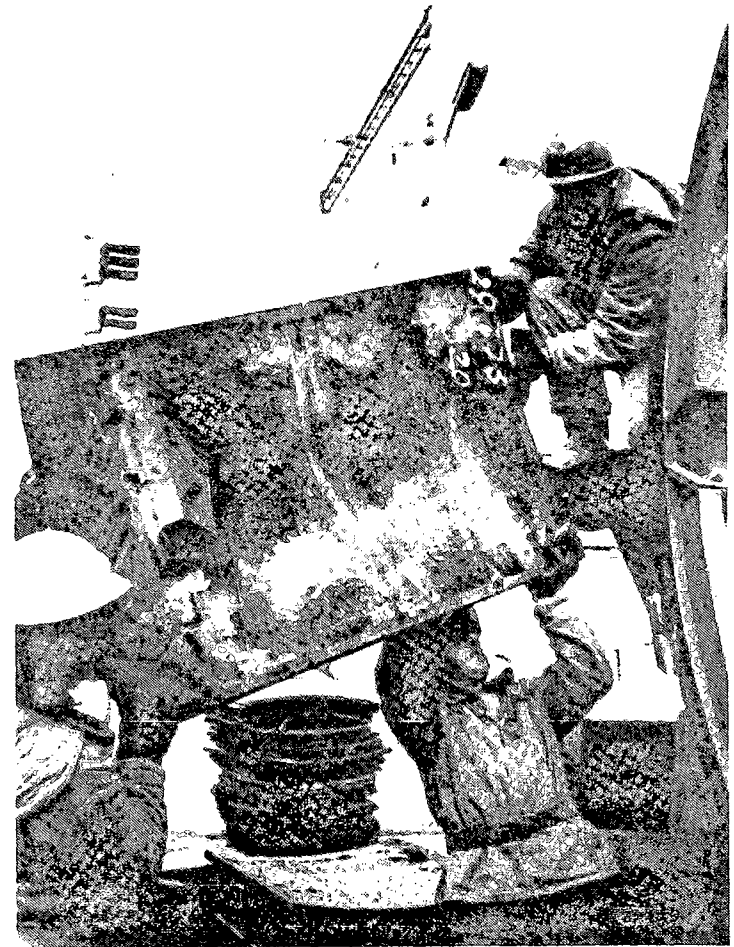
Placing of resin concrete segments on steel shuttering cages.
